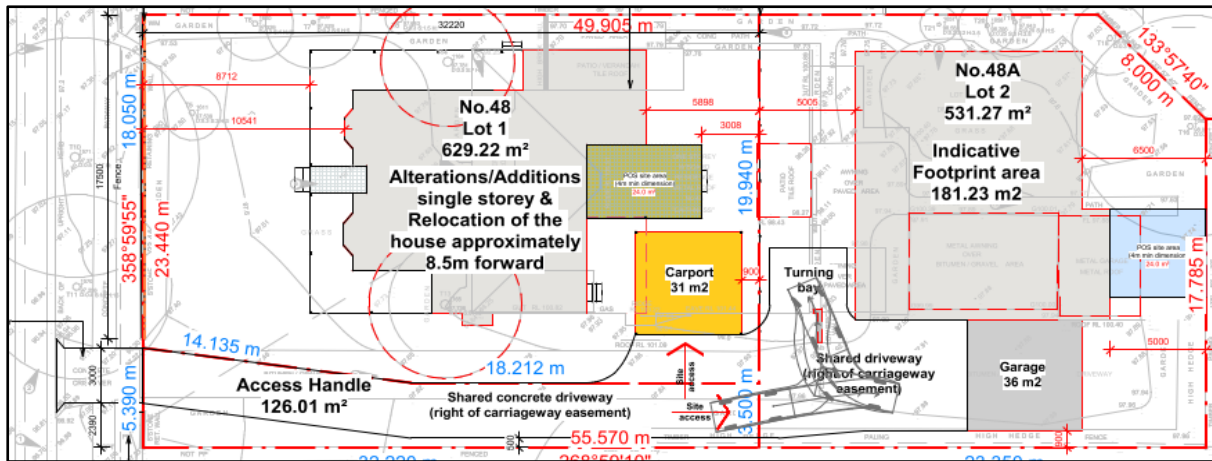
Proposed lot subdivision and layout of the site (extracted from the submitted plans)
